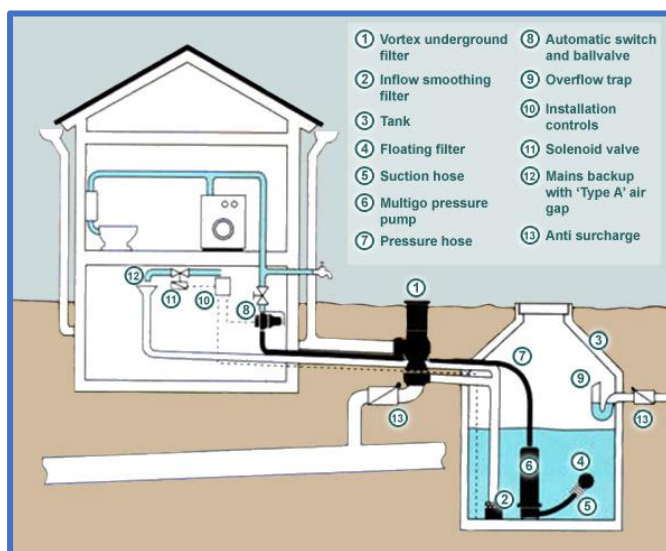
4: Typical installation for rainwater harvesting at a house (SuDS Wales, 2018)
